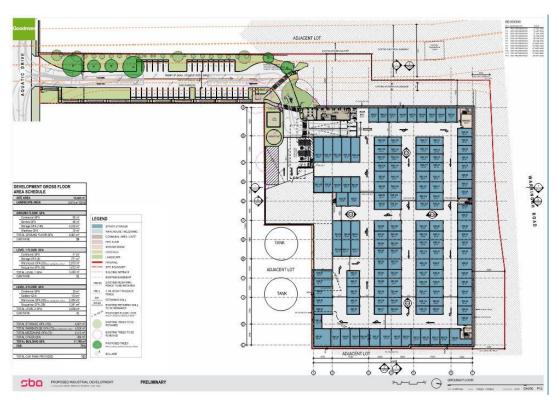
Proposed Development Layout (Ref. SBA Drawing DA200\_P11)
